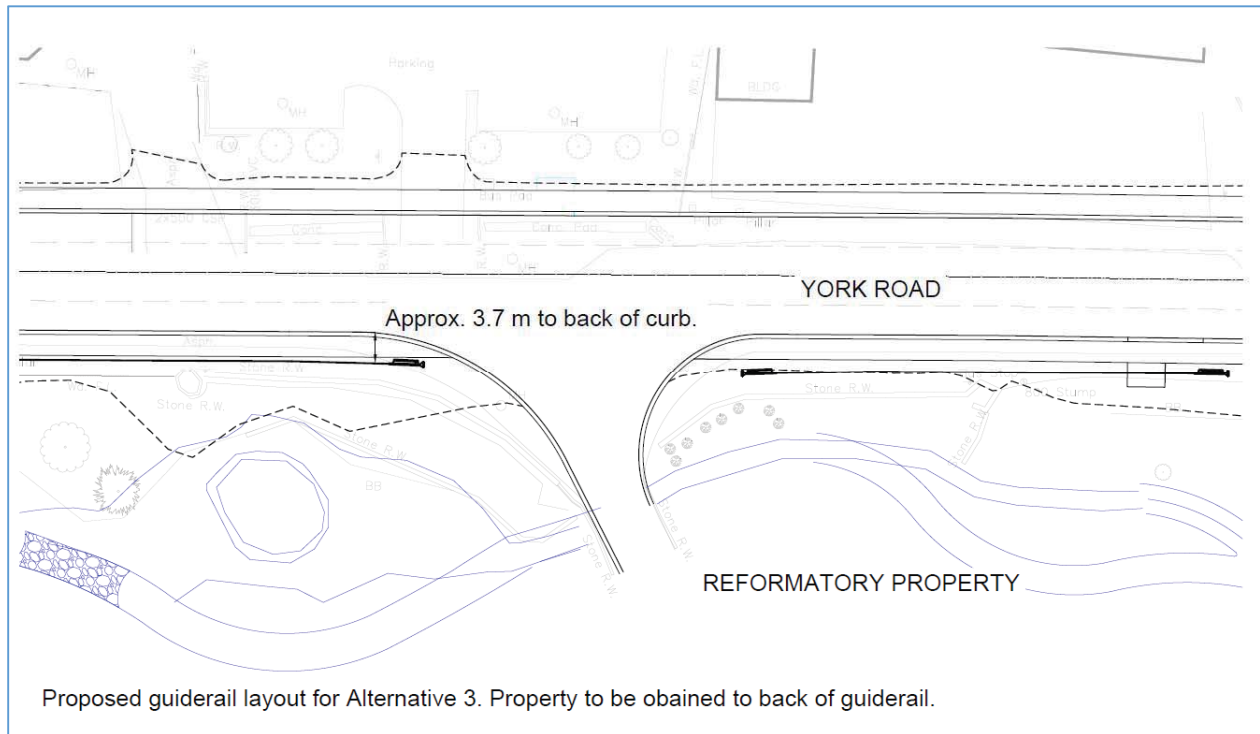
Roadway Plan View for York Road Alternative 3.
